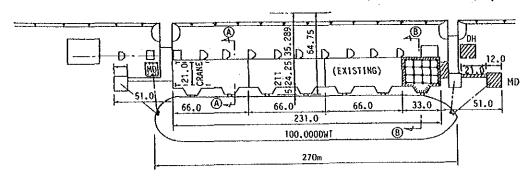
Lay-out Plan of 100,000 DWT Iron Ore Berth
